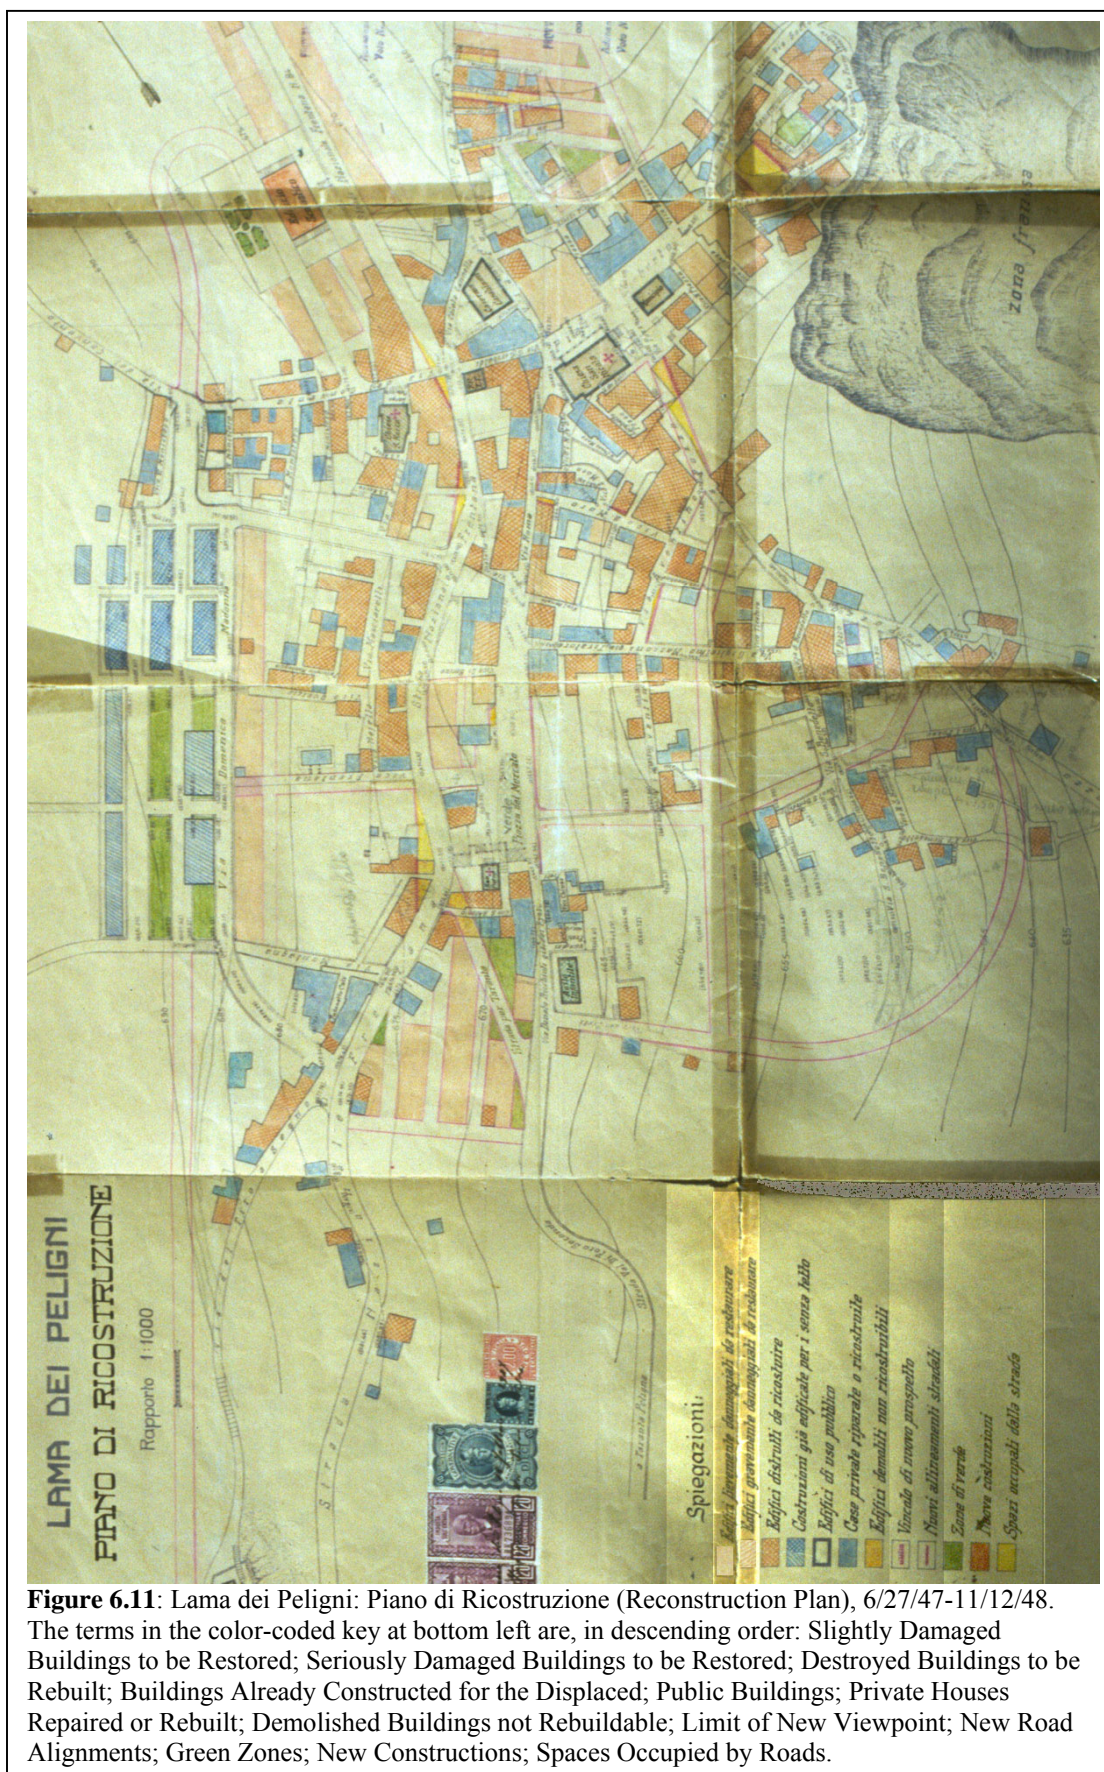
Lama dei Peligni: Piano di Ricostruzione (Reconstruction Plan), 6/27/47-11/12/48. The terms in the color-coded key at bottom left are, in descending order: Slightly Damaged Buildings to be Restored; Seriously Damaged Buildings to be Restored; Destroyed Buildings to be Rebuilt; Buildings Already Constructed for the Displaced; Public Buildings; Private Houses Repaired or Rebuilt; Demolished Buildings not Rebuildable; Limit of New Viewpoint; New Road Alignments; Green Zones; New Constructions; Spaces Occupied by Roads.
